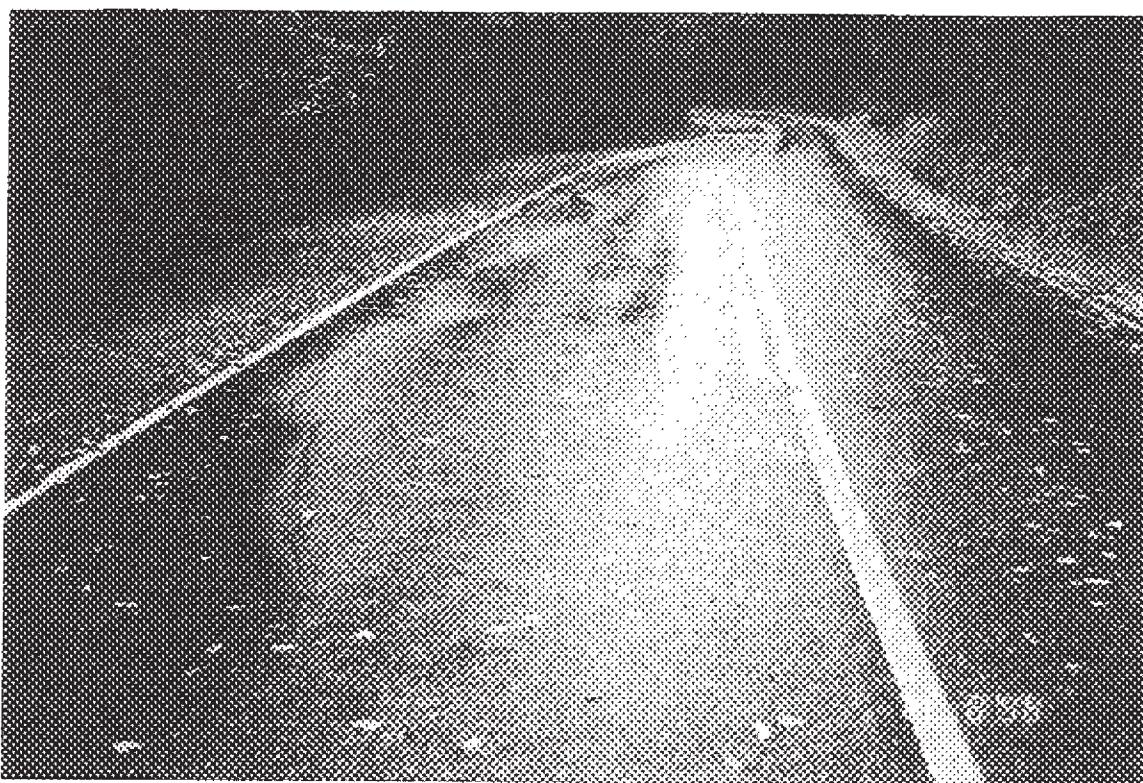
MP 6.00 - Subgrade failure, local cracking
